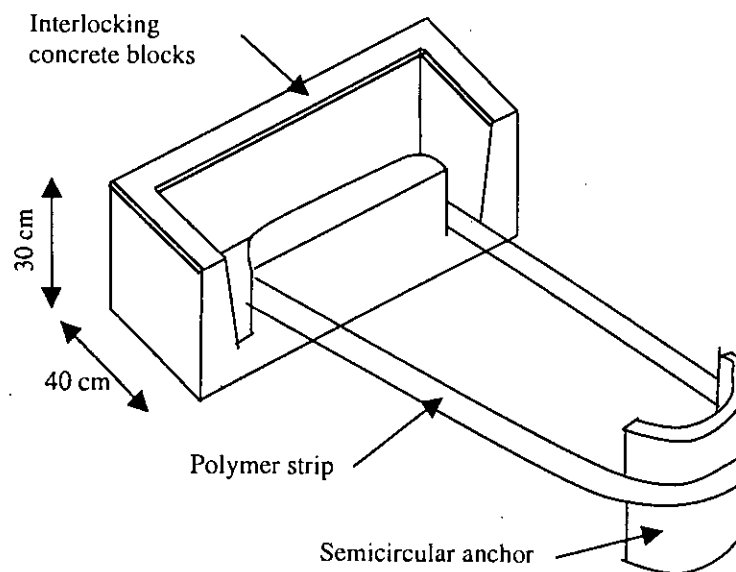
Anchor system with concrete blocks and polymer strips
